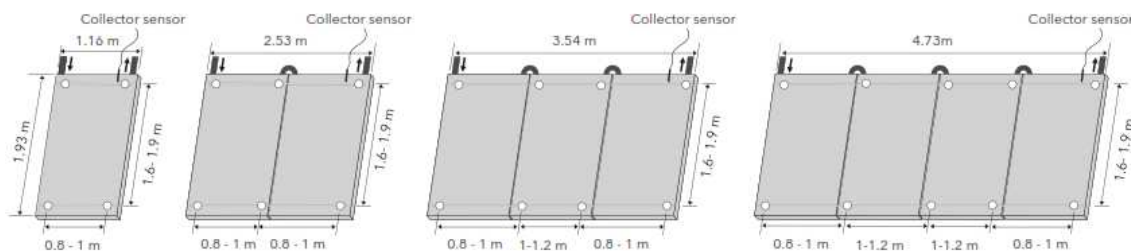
Vertical collector arrangement: Up to 4 EURO C22 in serial connection. The mounting rails run vertically. More than 4 EUROs are combined from serial and parallel connections.
